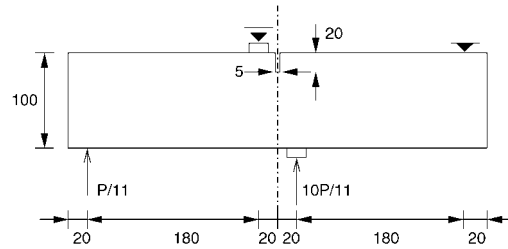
SEN beam. All dimensions in millimetres (depth = 100 mm).
